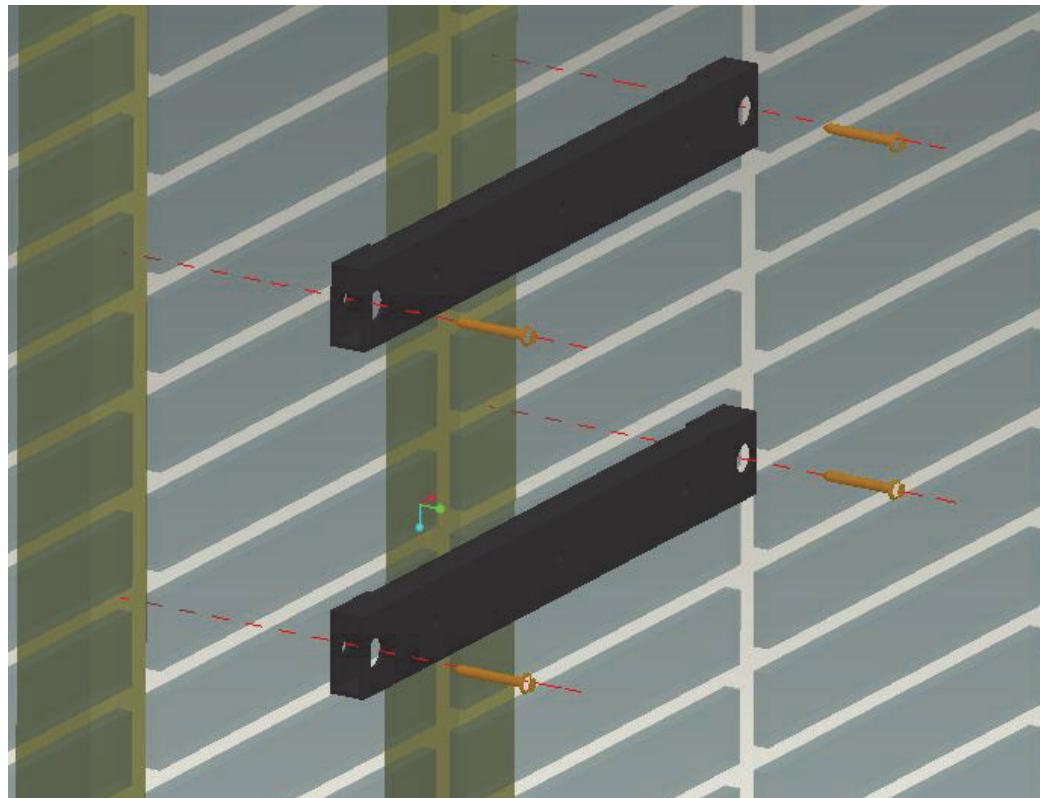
Fasten the Cross Bar against stud wall with wood screw
